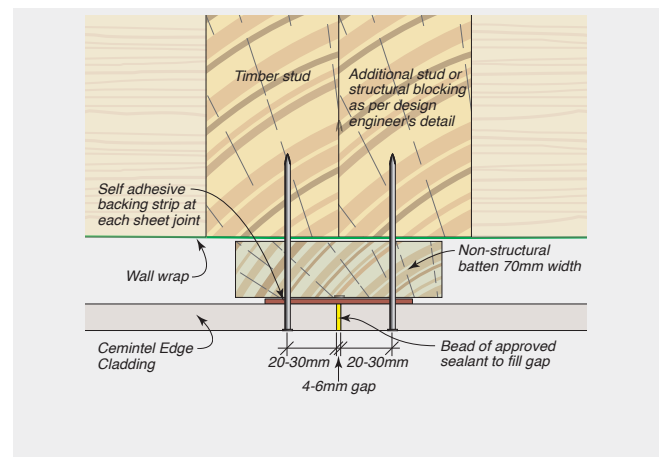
Typical Cavity Fix Cladding to Batten – Vertical Joint
